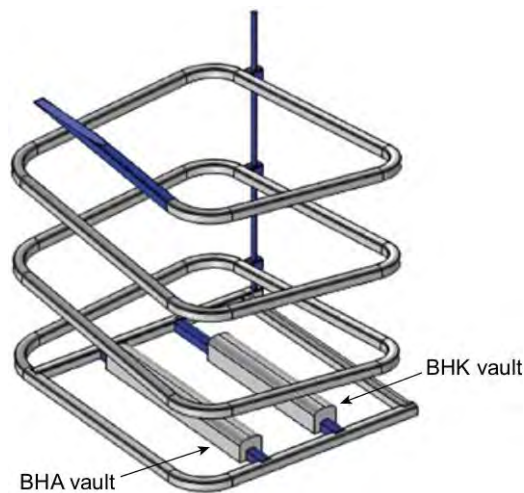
Locations of sealing sections (shaded in blue) to be installed at closure in the tunnel sections connecting between the vaults and the access tunnels, the vertical shaft and in the upper part of the access ramp.
